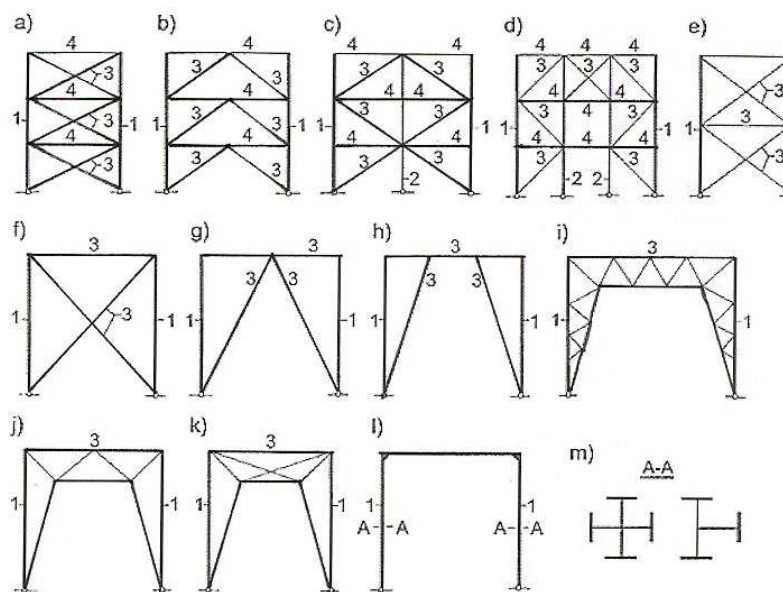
Schemes of sidewall columns bracings: 1- primary column, 2- secondary column, 3- bracing, 4- wall girt
